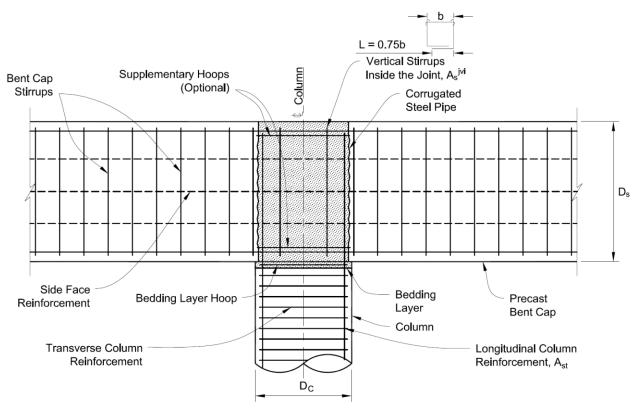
Cap Pocket Joint Shear Reinforcement Details (Elevation)—SDC B
